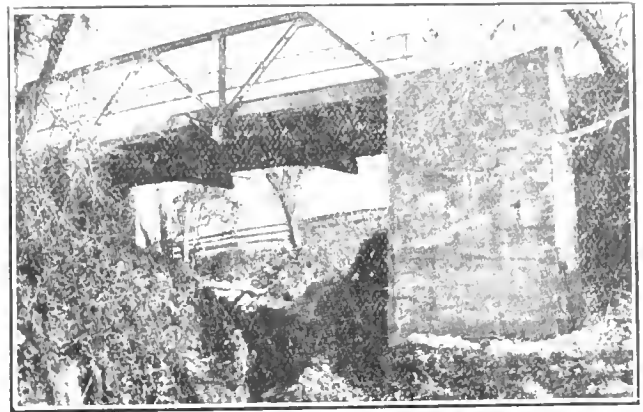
This 40-ft. Steel Span on 20-ft. Abutments has a Drainage Area of Only 69 Acres. Cost \$5,187.
